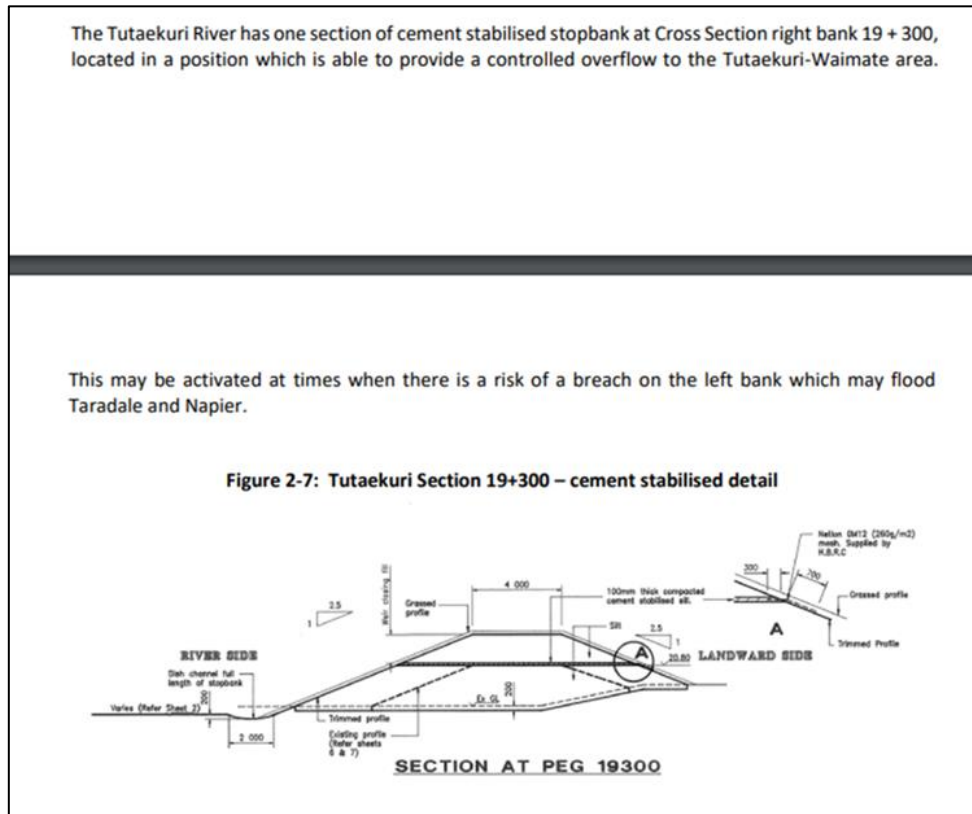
Extract of Heretaunga Plains Asset Management Plan detailing a designated breach point
